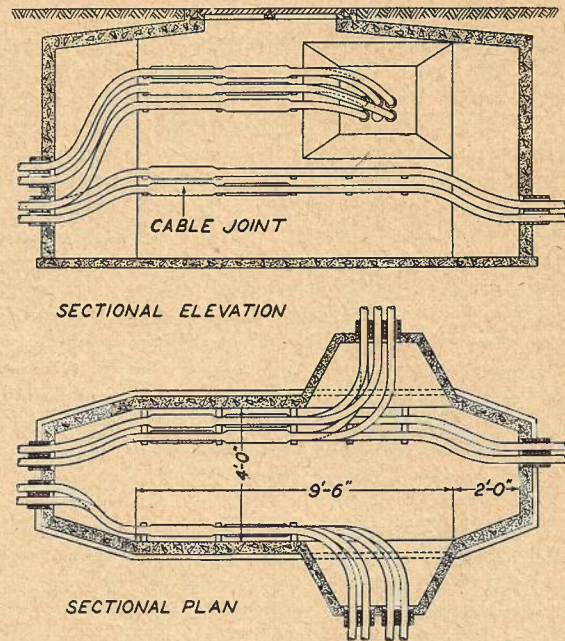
Suggested Manhole for junction of Conduit Routes. (Two cables per bearer provided on one wall to economise in space.)
